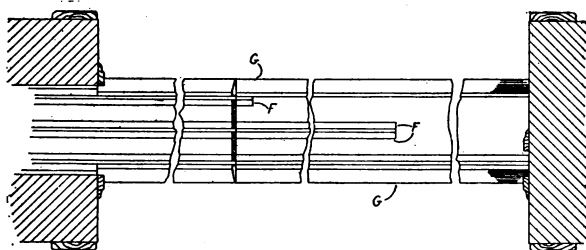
PLAN OF FLOOR GUIDE FOR STEADYING THE BOTTOM OF A DOOR
